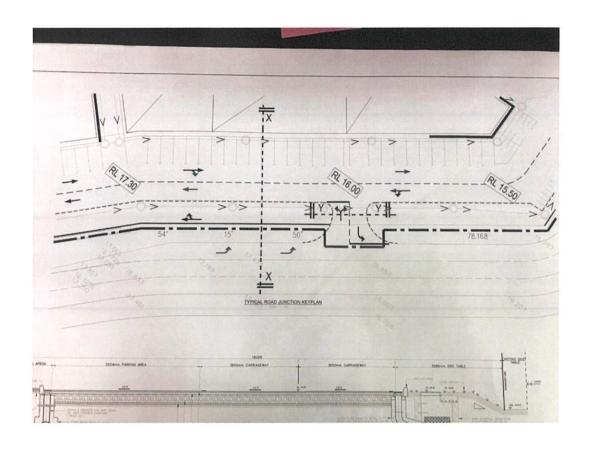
Shows the detail drawing for the road marking for Neuvo Centro 2 project
